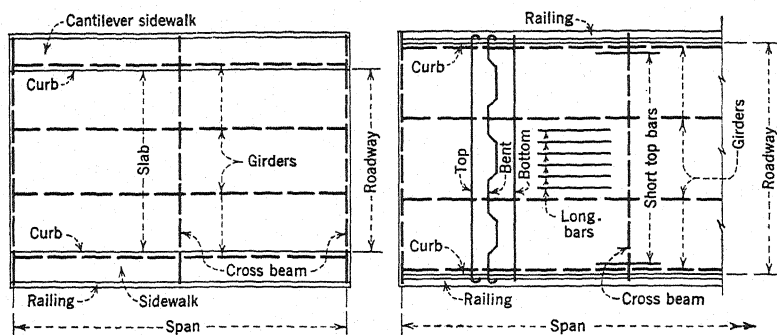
Floor Plans of Girder and Slab Type Bridges. (See p. 50.)
